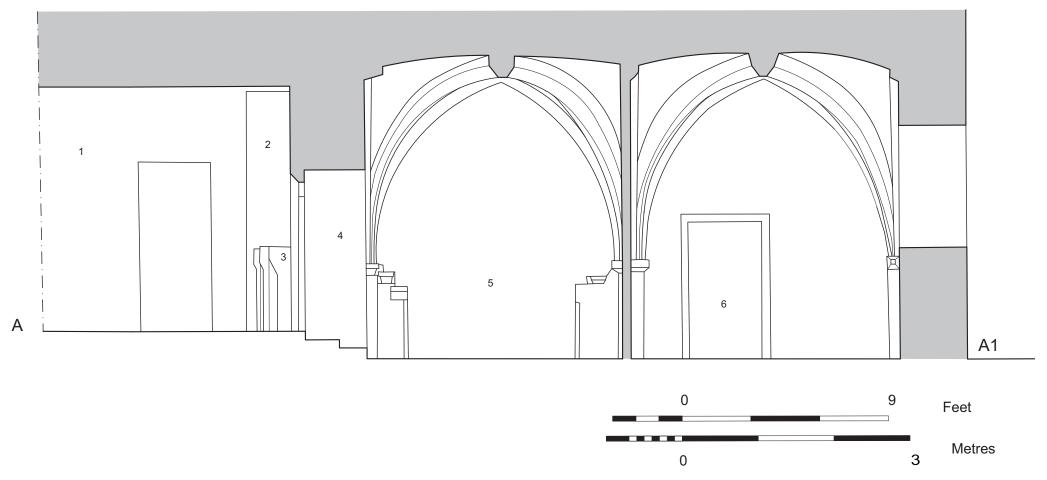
Sectional Elevation A-A1. North facing. Print Scale 1:50
